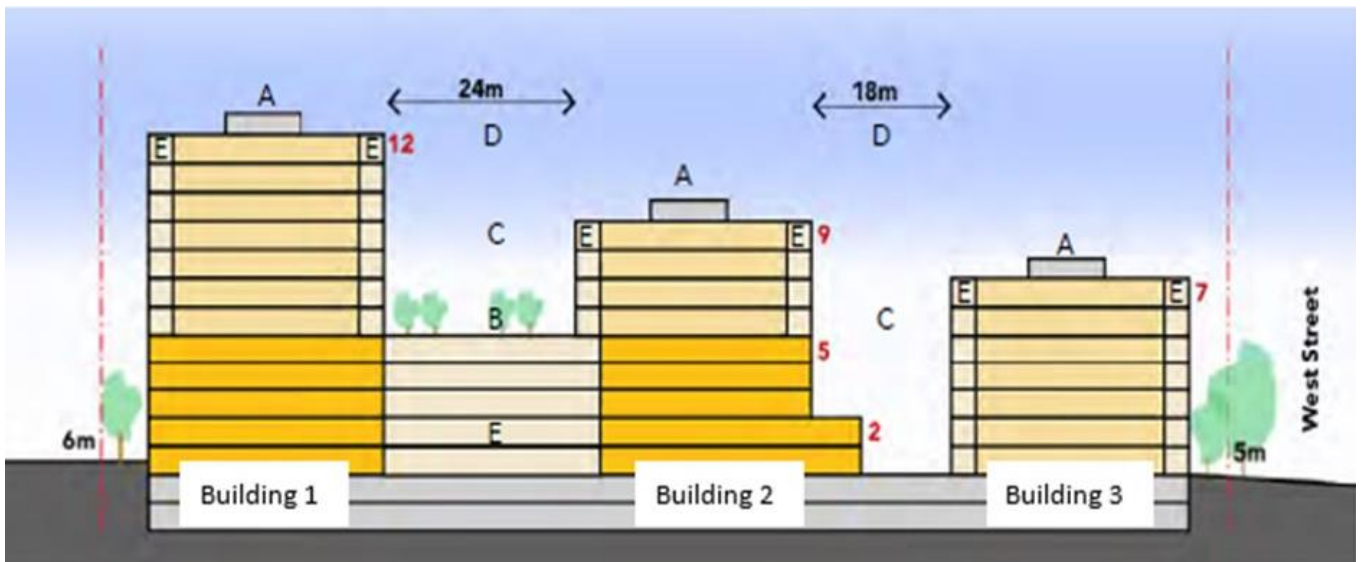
East-West Cross Section of Buildings 1 to 3 from the south (Source: West Street Precinct Masterplan by UrbanAC)
